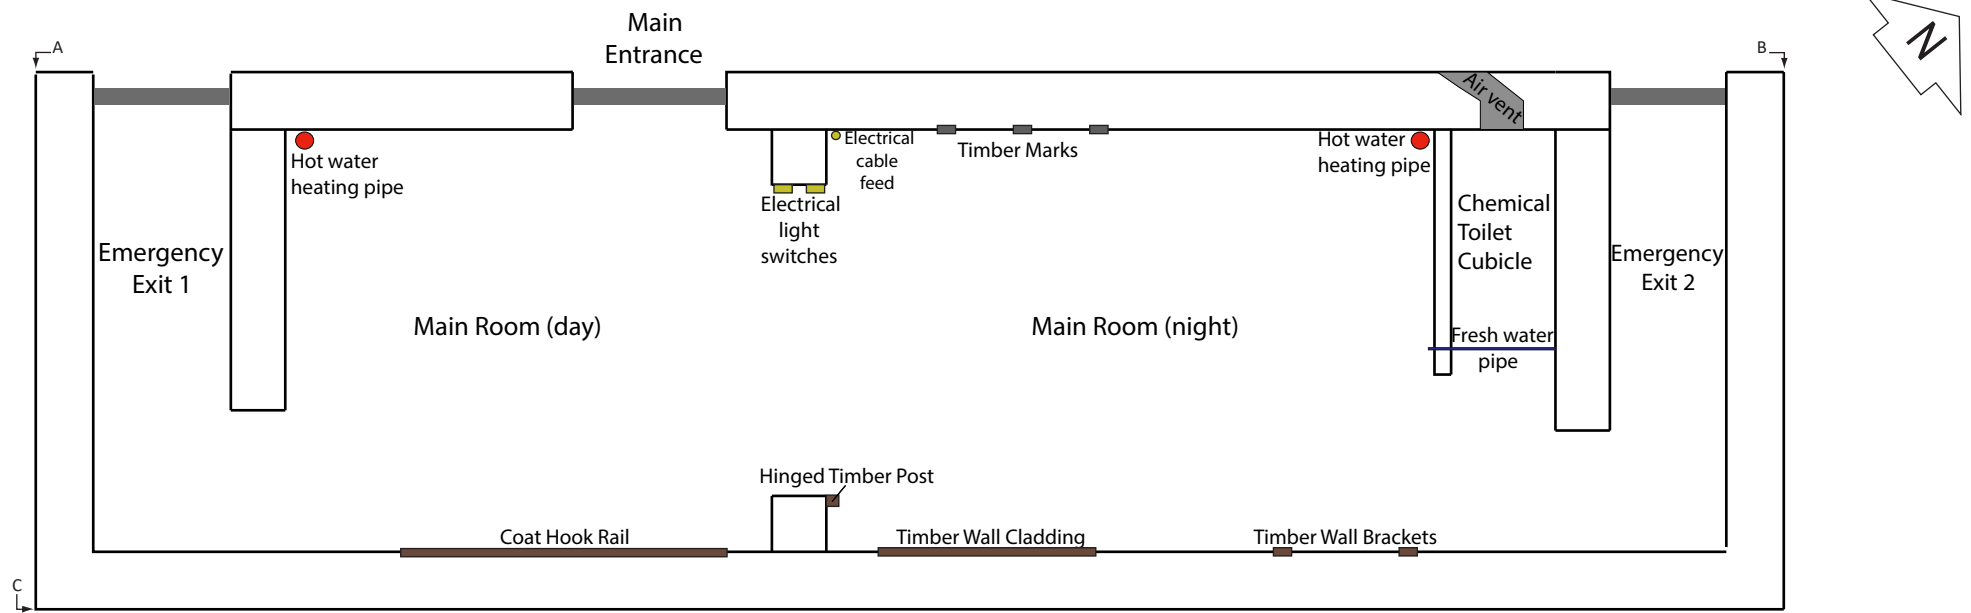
Plan and elevation drawings of Air Raid Shelter 1.
